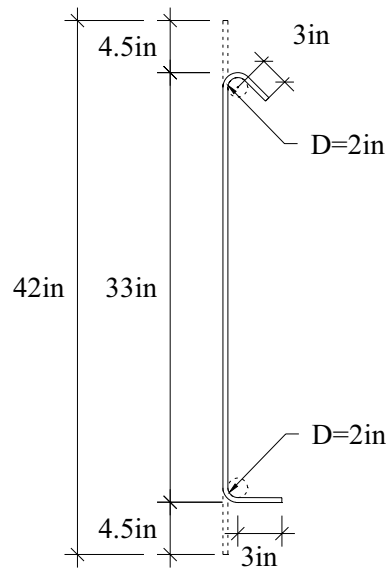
Section B-B; Cross Tie (B) #4 Detail; Specimens G1 & G2
